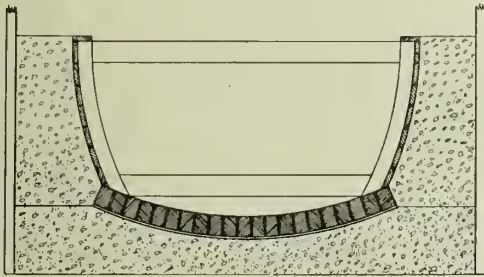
Formwork for Concrete Invert and Sidewalls.
